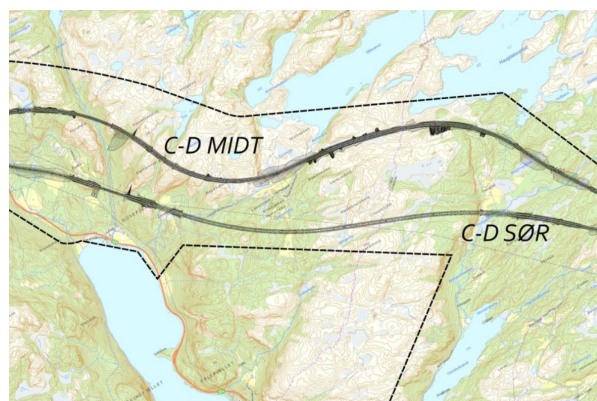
Alternatives. The figures show the tunnel alternative (C-D Sr) and the road on the surface alternative (C-D Mid).
